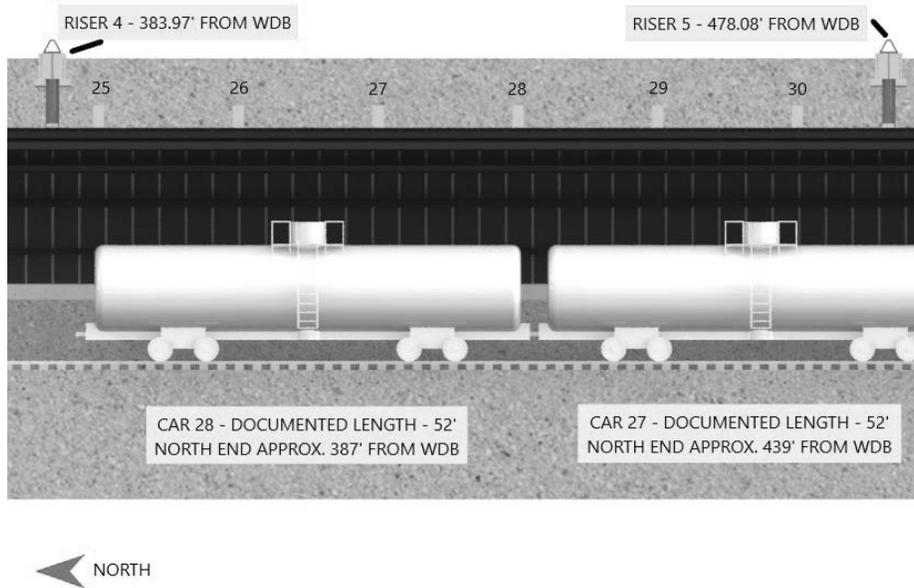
Riser 4 to Riser 5 Tunnel Section.
